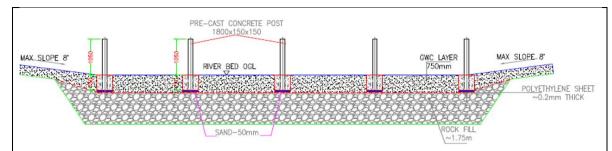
A typical Concrete drift section with rock fill, which permits subterranean flow.
